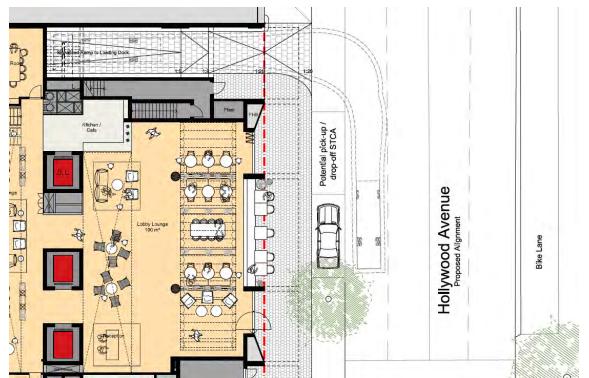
Future Indented Bays in Hollywood Avenue as part of Council's Complete Streets project
